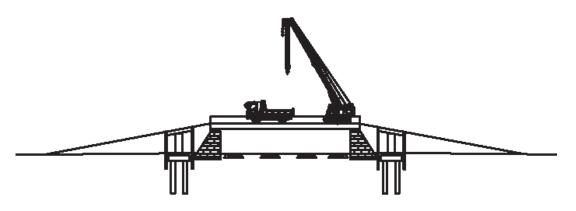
Reconstruction Procedure of Step 2 for Type-1 Bridge
